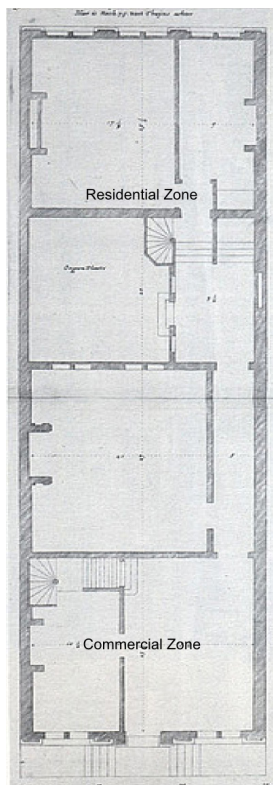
Typical plan of Amsterdam waterfront dwelling
